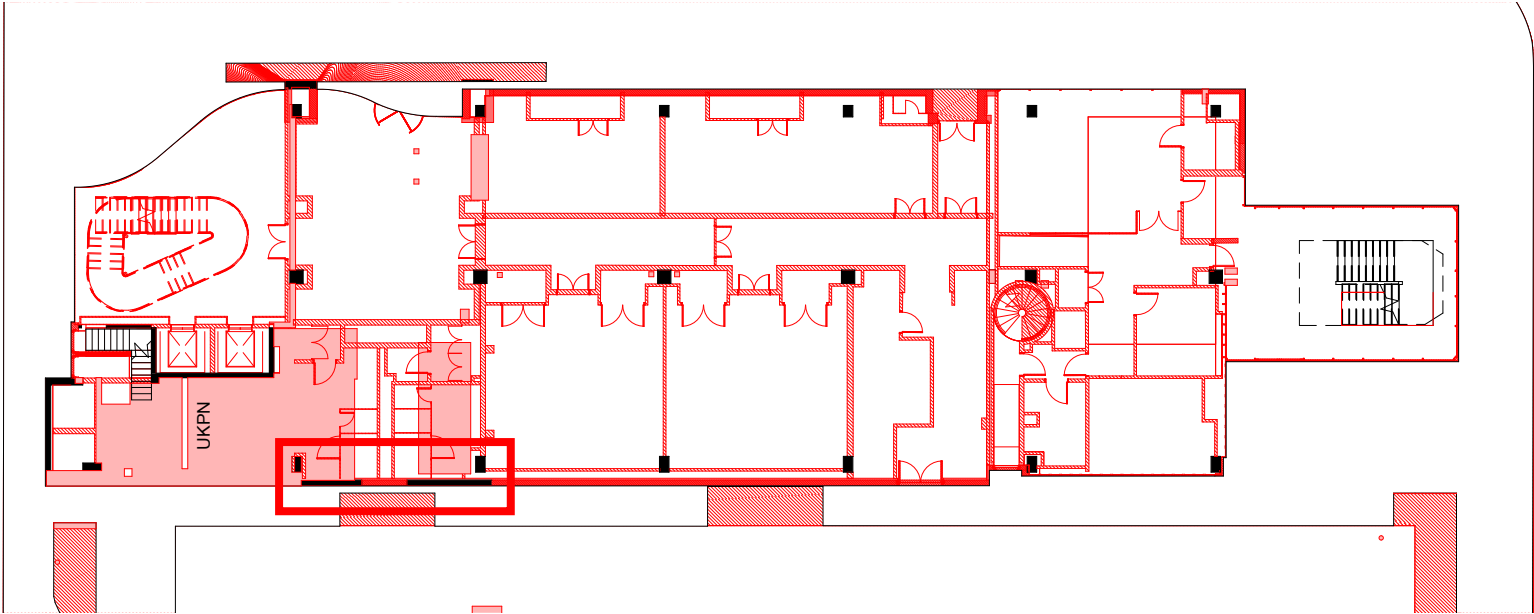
Consented Ground Floor Plan - Loading Bay Wall Location
